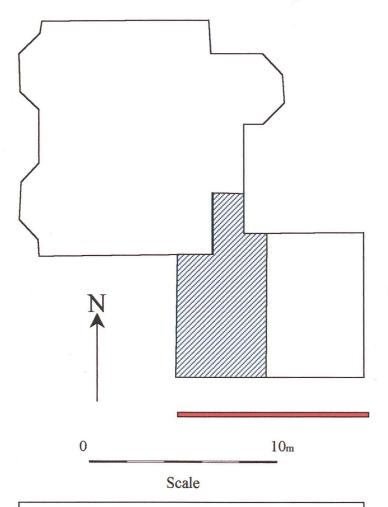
Ground plan of existing buildings and extension (extension shown hatched).
